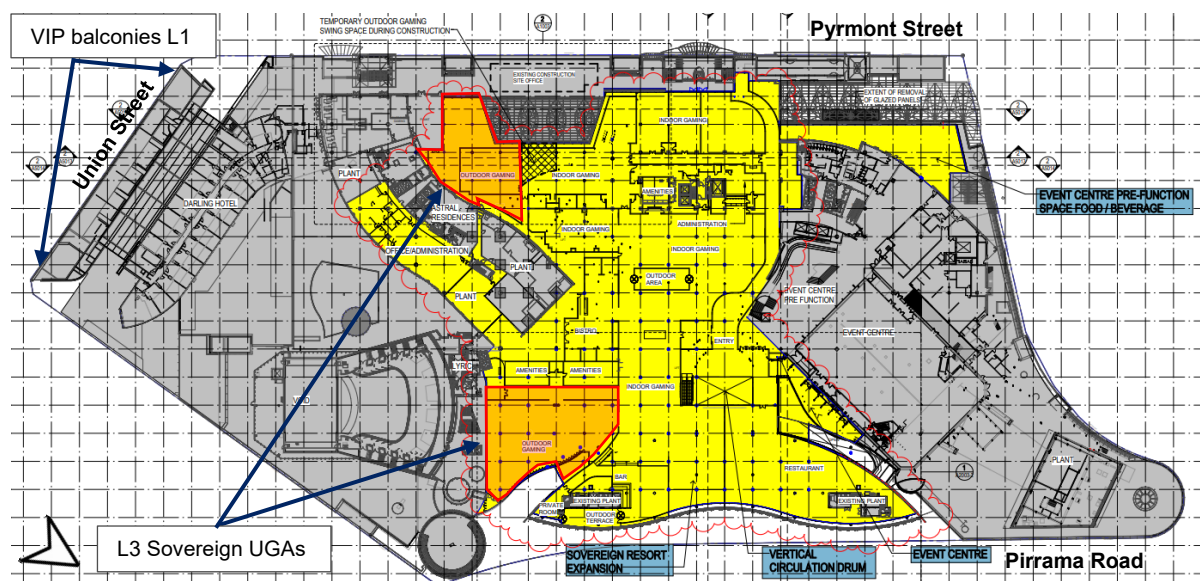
| Level 3 Sovereign Room UGAs and outdoor terrace on Pirrama Road (Source: MOD 14)
